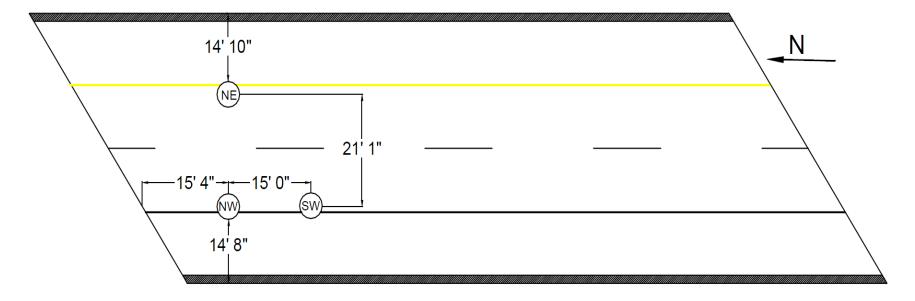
Sensor locations on Dannon Way southbound conventional concrete deck.
